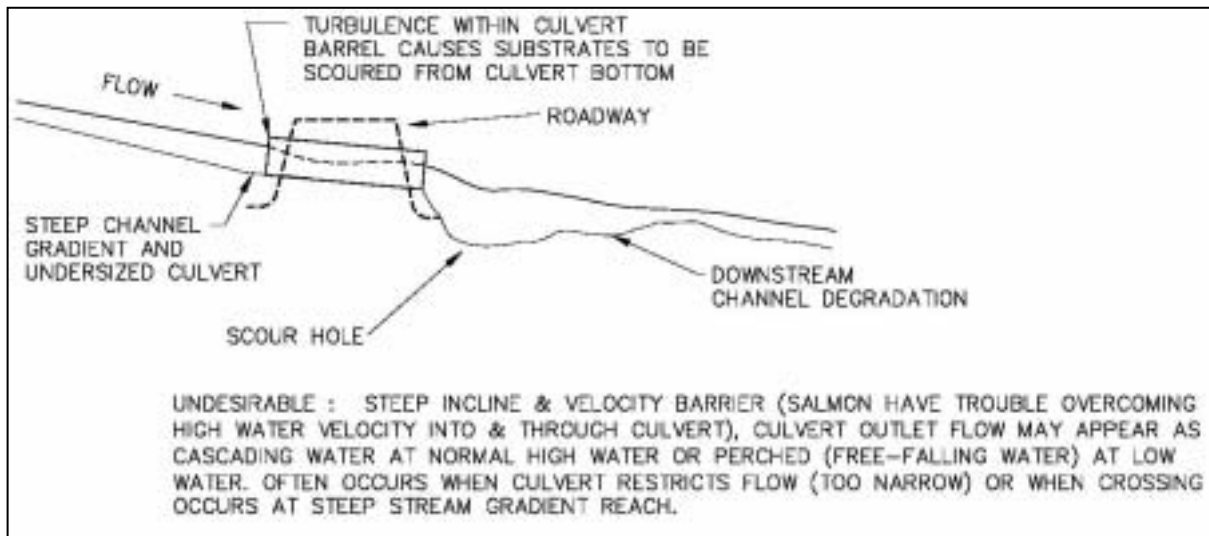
Stream Crossing with Perched Culvert
